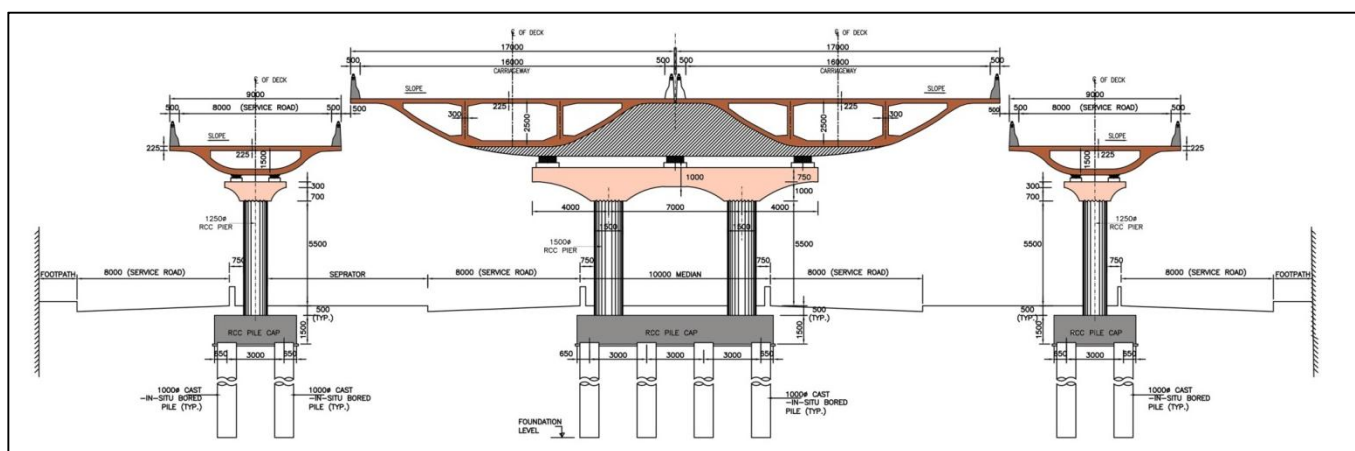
Typical Cross Section (TCS-1) of Elevated Portion of Dwarka Expressway
